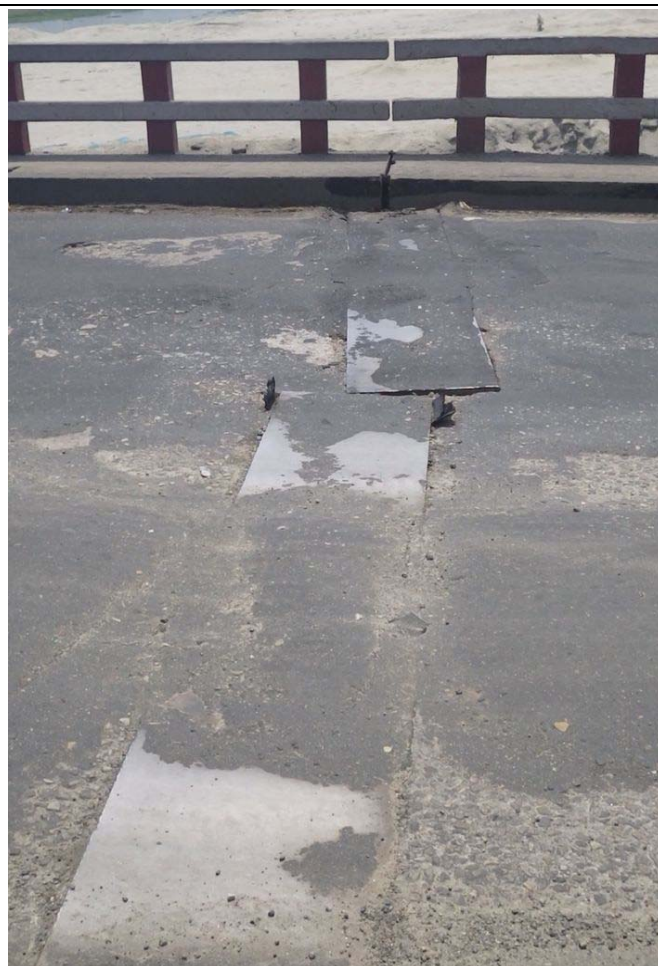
Damaged Expansion Joint (2 feet wide T-shaped steel plate is used as expansion joint all through the bridge)
